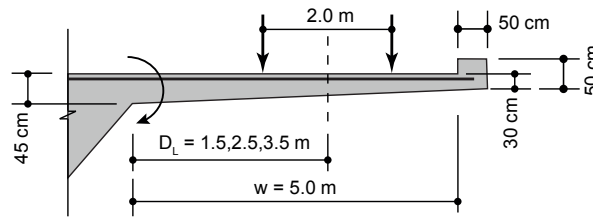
Dimensions of studied cantilever slab and traffic lane position
